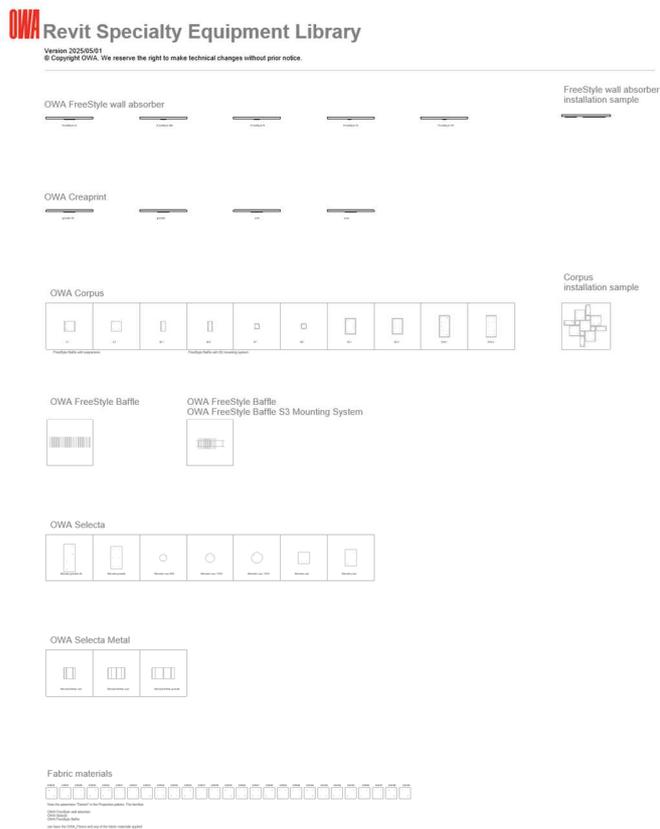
Plan View in the file Revit Specialty Equipment Library.rvt
